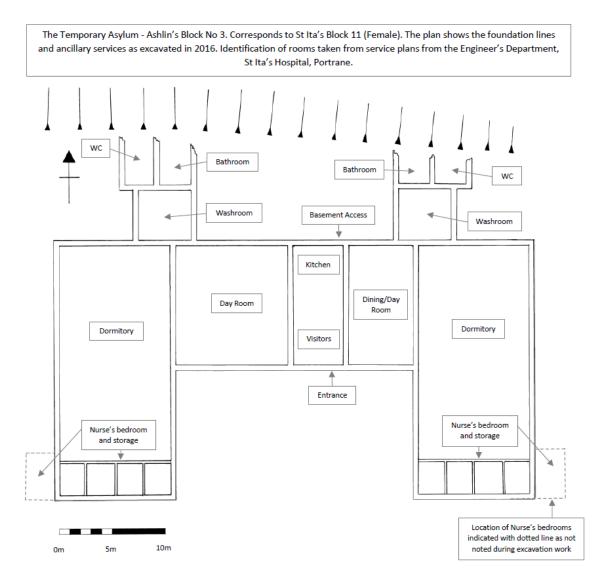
Area 2. Plan of Ashlin's building No 3 / Block 11 as excavated (2016)
